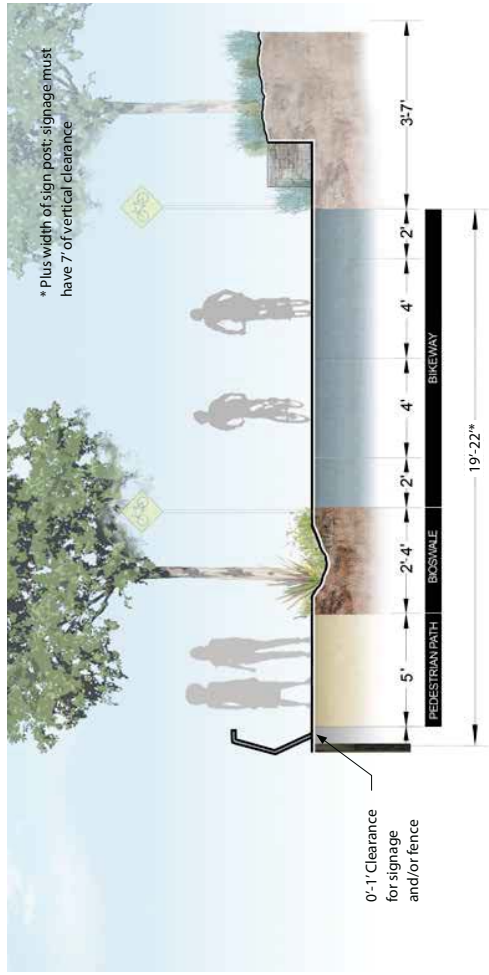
Moorpark Avenue to Woodman Avenue - Typical Cross Section
